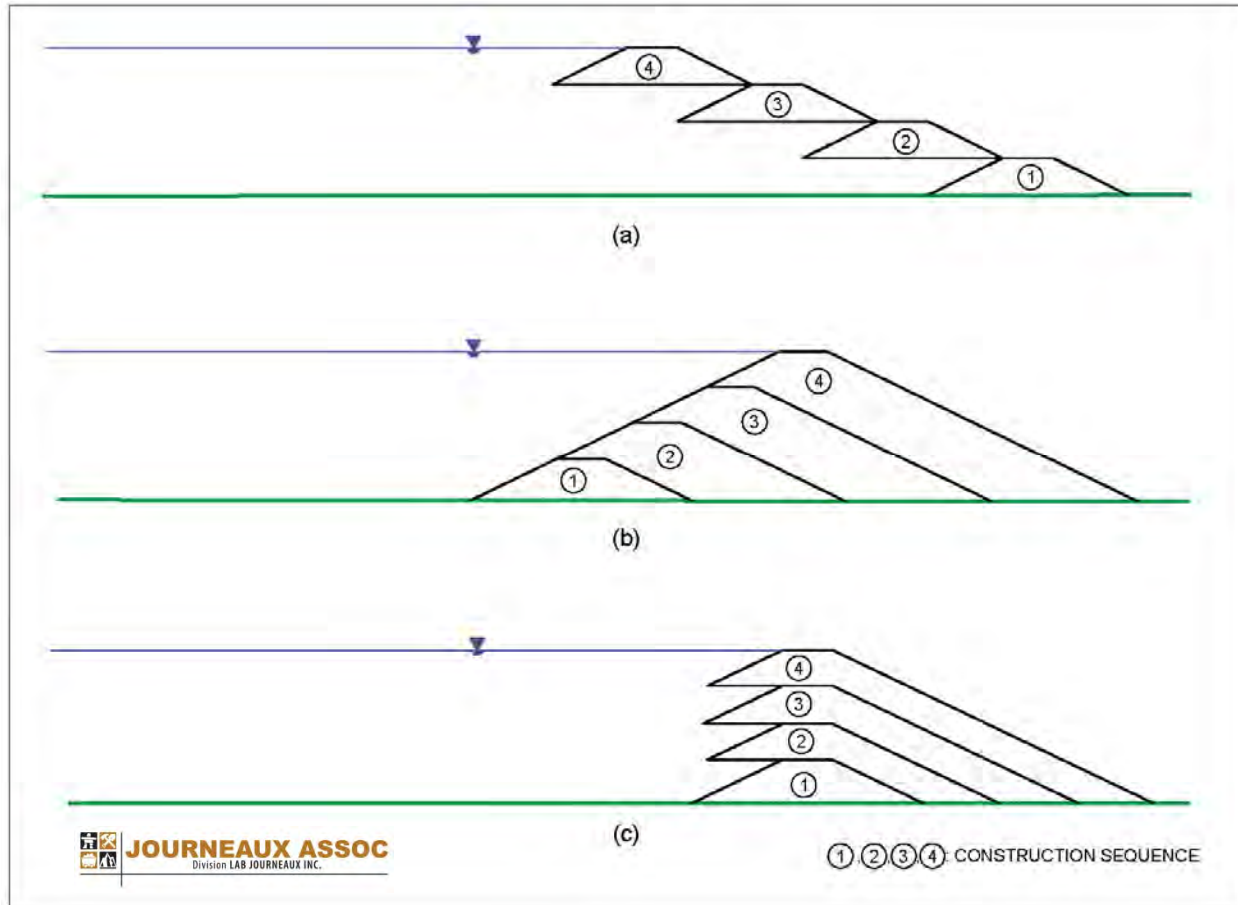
Typical construction methods for tailings dykes; (a) upstream construction, (b) center axis (or centerline) construction, (c) downstream construction
